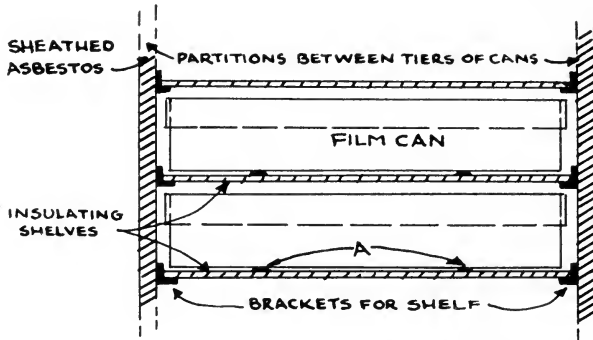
Front-view elevation. A, "blisters" to support cans and create air and water space.
